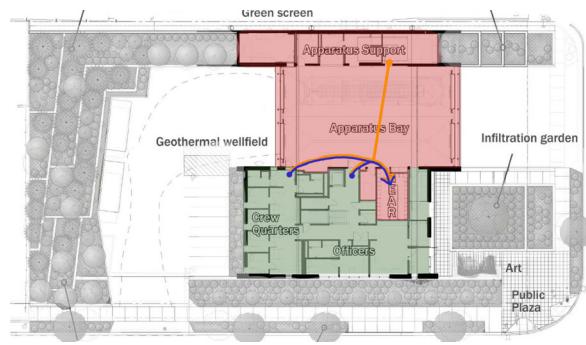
Diagram Over Fire Station 20 First Floor Plan <sup>54</sup>
